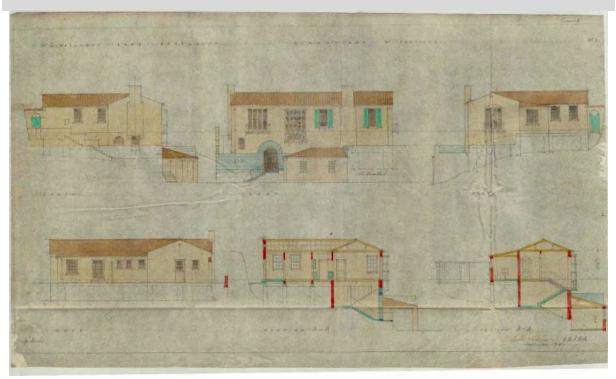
2 Wallaroy Road, Double Bay (Source: www.dharchitect.com.au)
